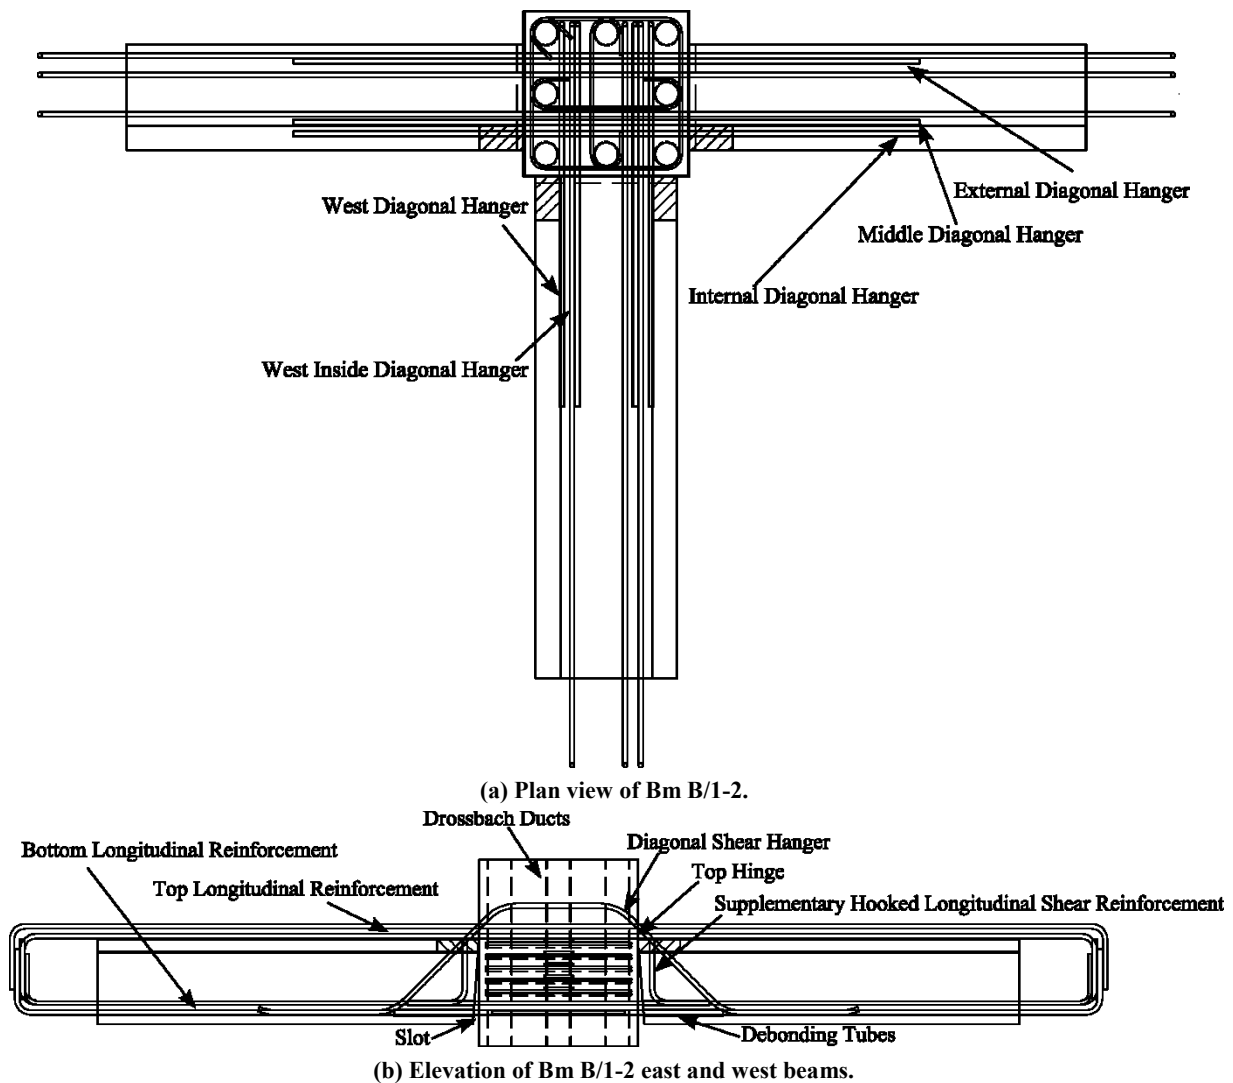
Specimen SA1 reinforcement naming conventions.
